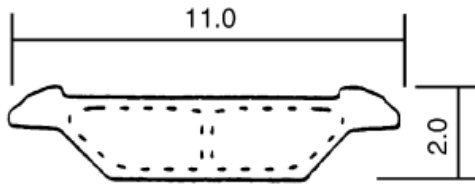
Deck cross-section for the Ikara Bridge, after Kubo et al. [4] (dimensions: m)
